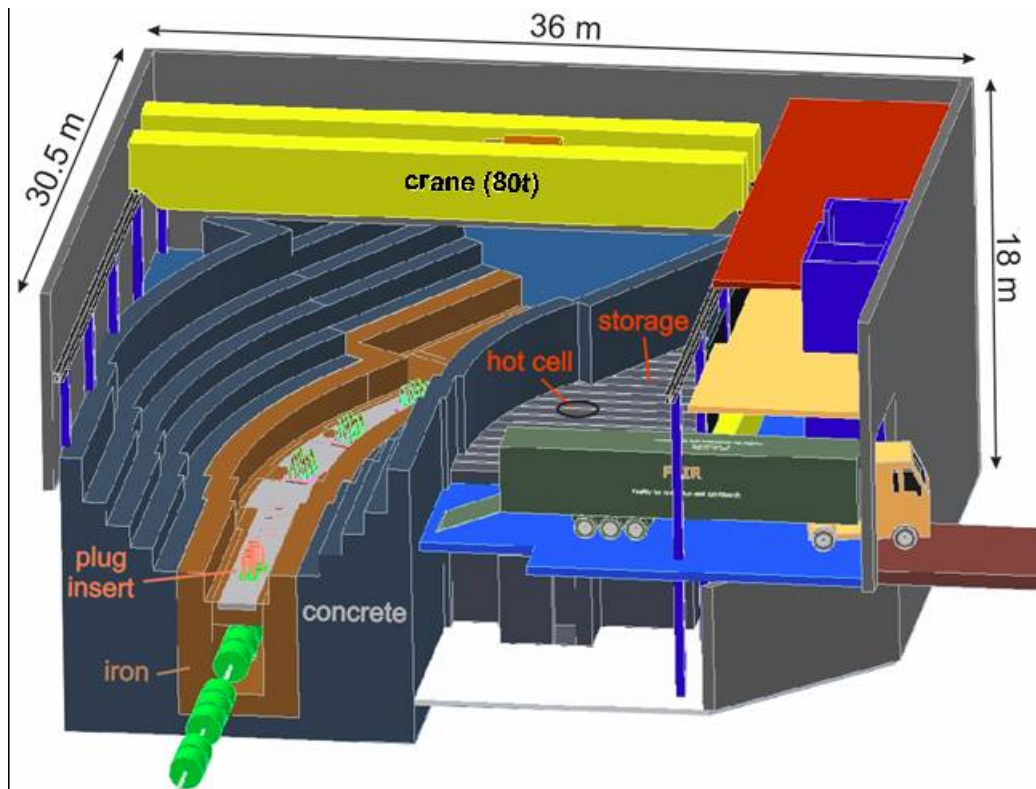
Layout of the Super-FRS target building. The top part of the concrete shielding can be removed to access the working platform. Heavy devices can be transported by crane to the nearby hot cell, storage places or directly onto a truck which can drive into the hall.
